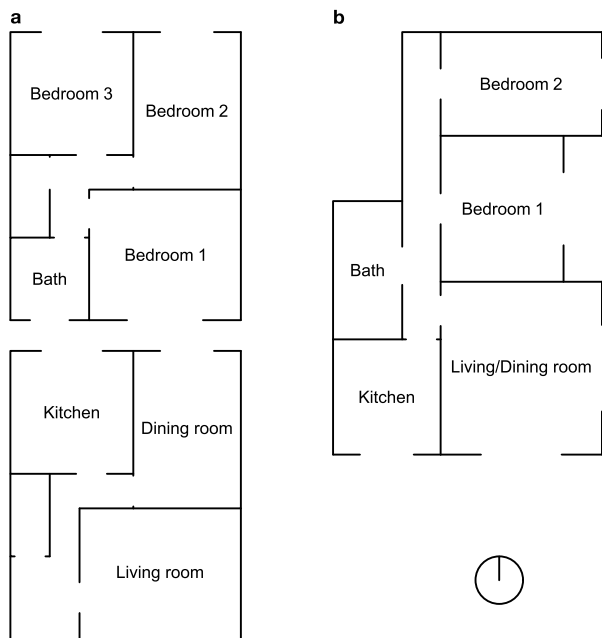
Floor plans of case study dwellings. Layouts of rooms, their windows and doors in the mid-terraced house (a) and the top-floor high-rise flat (b).
